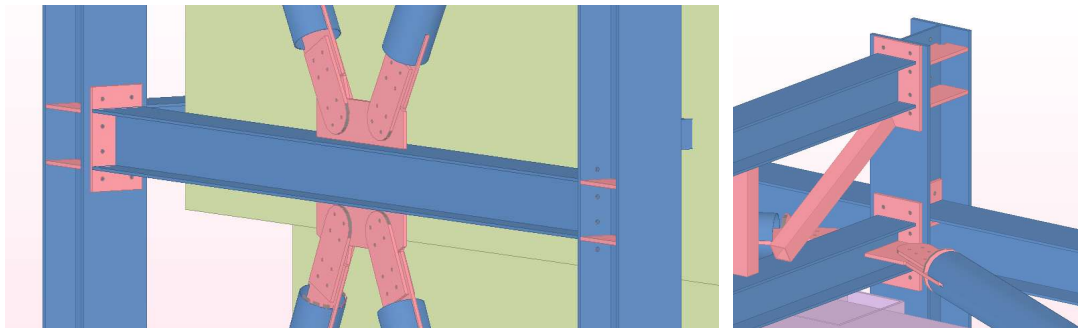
Detailed view with the exoskeleton: a) view with side frame and concentric braces; b) view with the top transversal truss beam and horizontal bracing.
